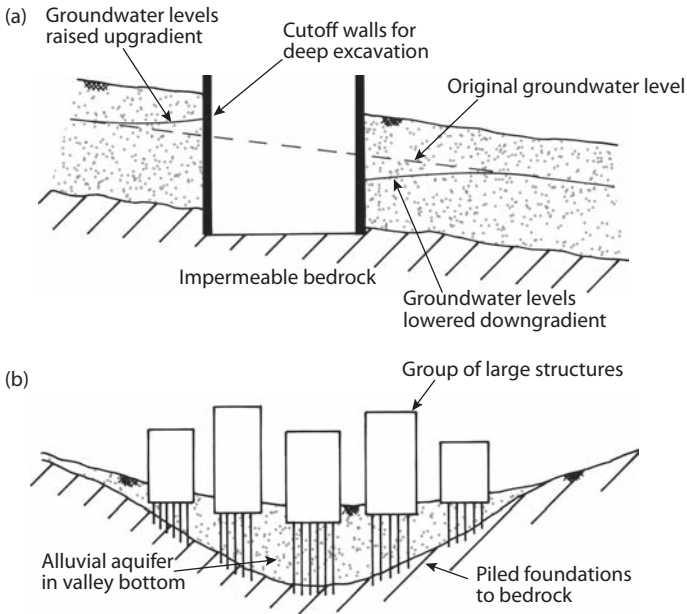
Barriers to groundwater created by cutoff walls and piles. (a) Cutoff walls. (b) Groups of piles. (After Preene, M., and Brassington, F.C., *Water and Environmental Management Journal*, 17(1), 59–64, 2003.)
